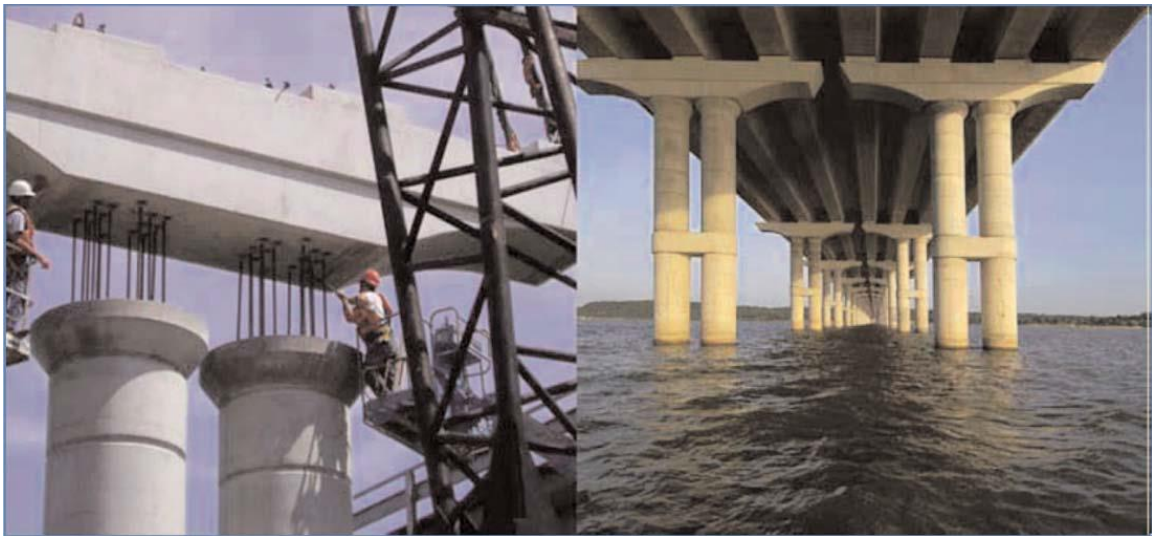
Precast concrete cap beam used in crossing state highway 36 over Lake Belton, Tx [5].
